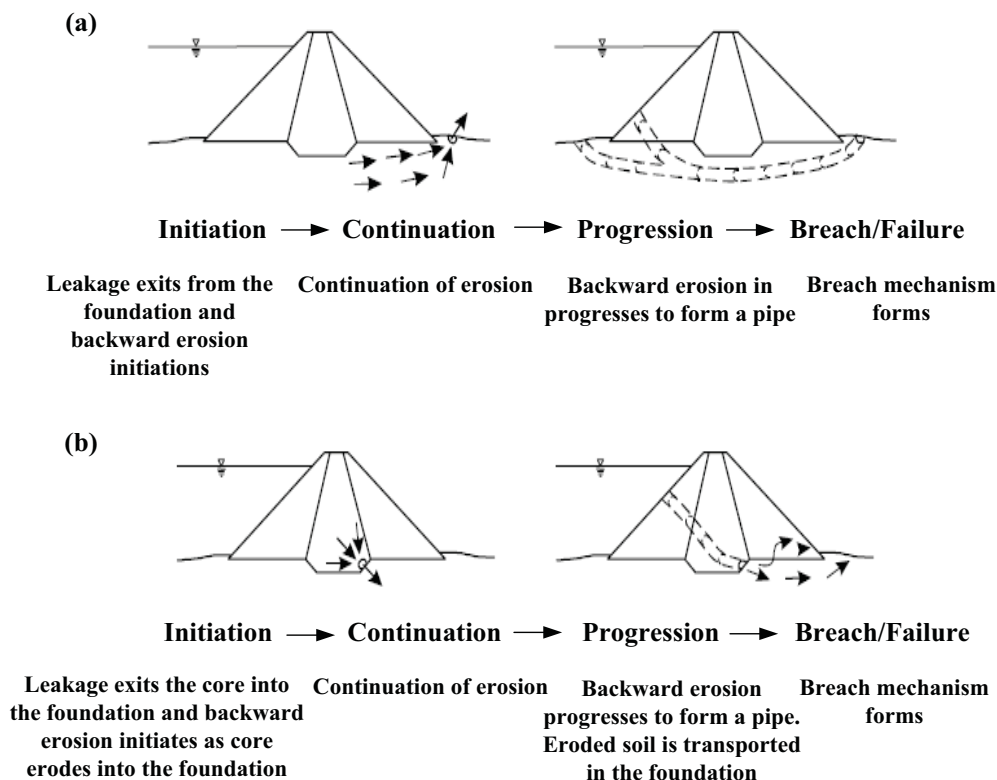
Models for the development of failure by piping in the foundation and from the embankment to the foundation [18]. a) Piping in the foundation initiated by backwards erosion. b) Piping from the embankment to foundation initiated by backwards erosion.
